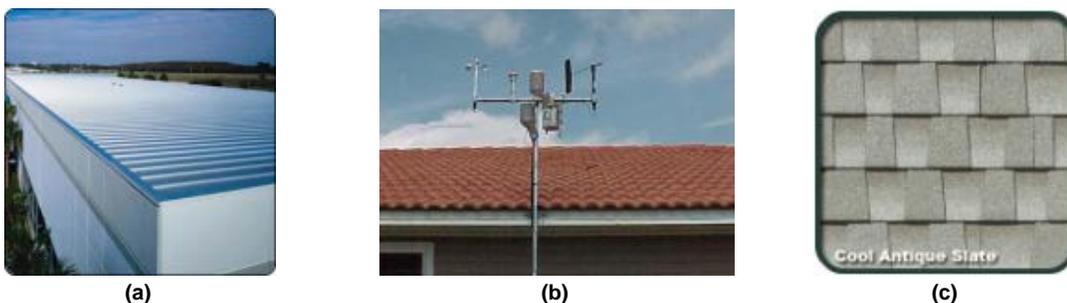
White metal roof (a), roof tile coatings (b), and architectural shingles (c) (<http://www.elkcorp.com>).
